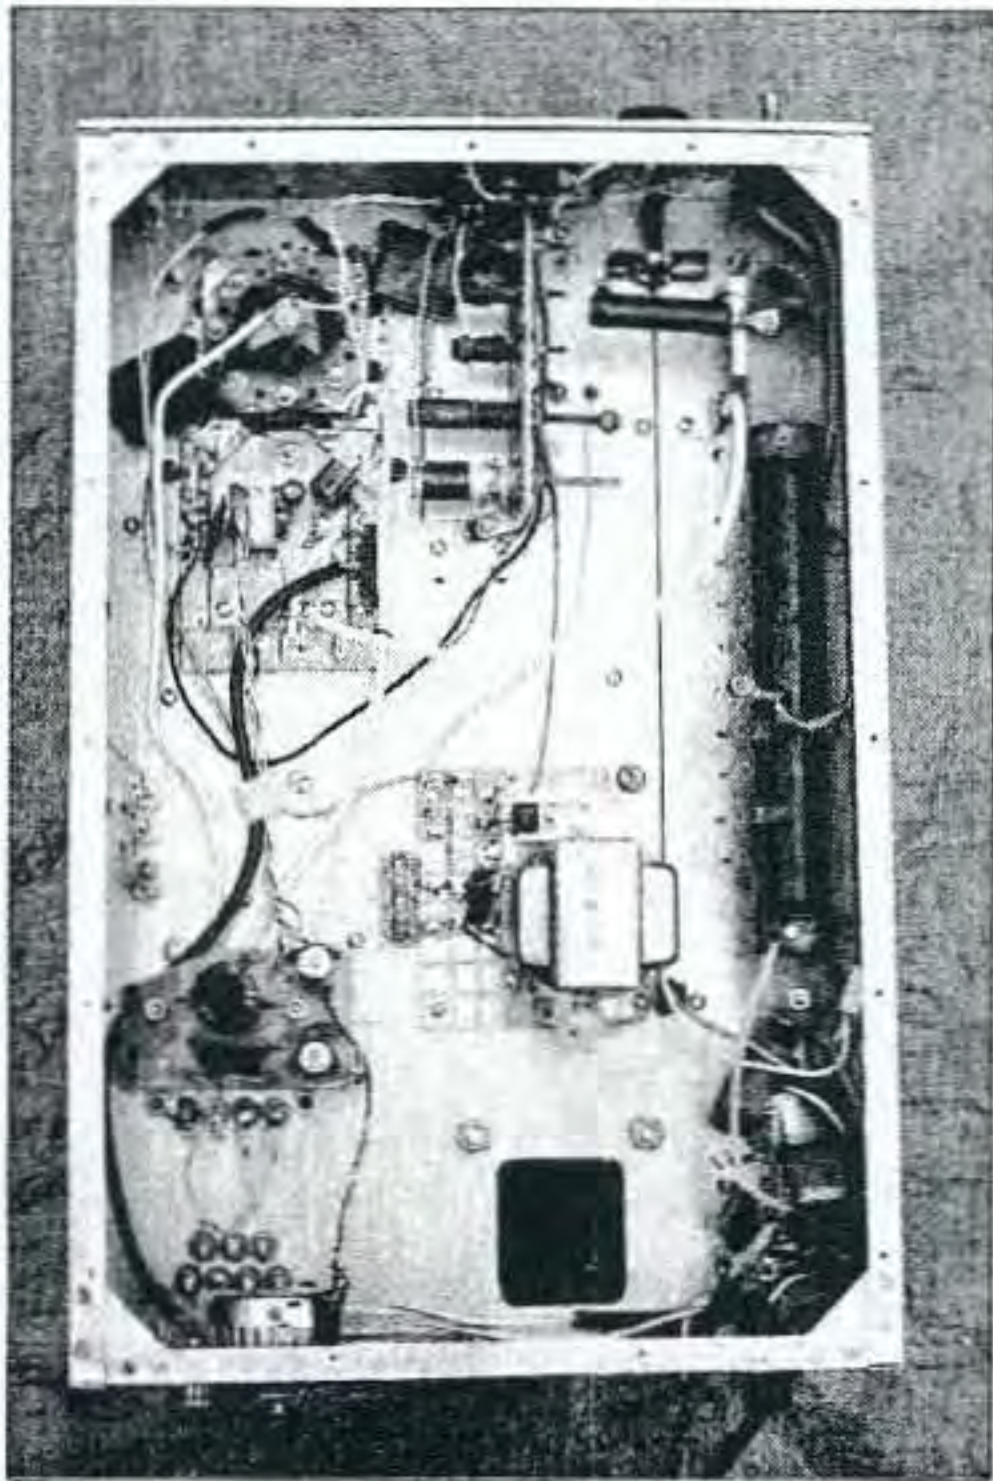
Photo B. The mechanism for the LOAD TUNE knob is near the front panel. Part of the knob can be seen alongside the toggle switch handle in this photo. The mechanism includes a small bracket made of sheet copper soldered to a 1/4-20 nut. The bracket bears against the chassis to prevent rotation of the nut. It also has a small hole drilled in it for attaching the dial cord. A washer has been fastened to the threaded end of the decapitated LOAD TUNE bolt and the PLATE TUNE bolt to act as a stop to prevent completely unscrewing the nut. I drilled and tapped the ends to accommodate a small screw for this purpose. R3 is mounted on the back end of the chassis for ease in adjusting control-grid bias.
